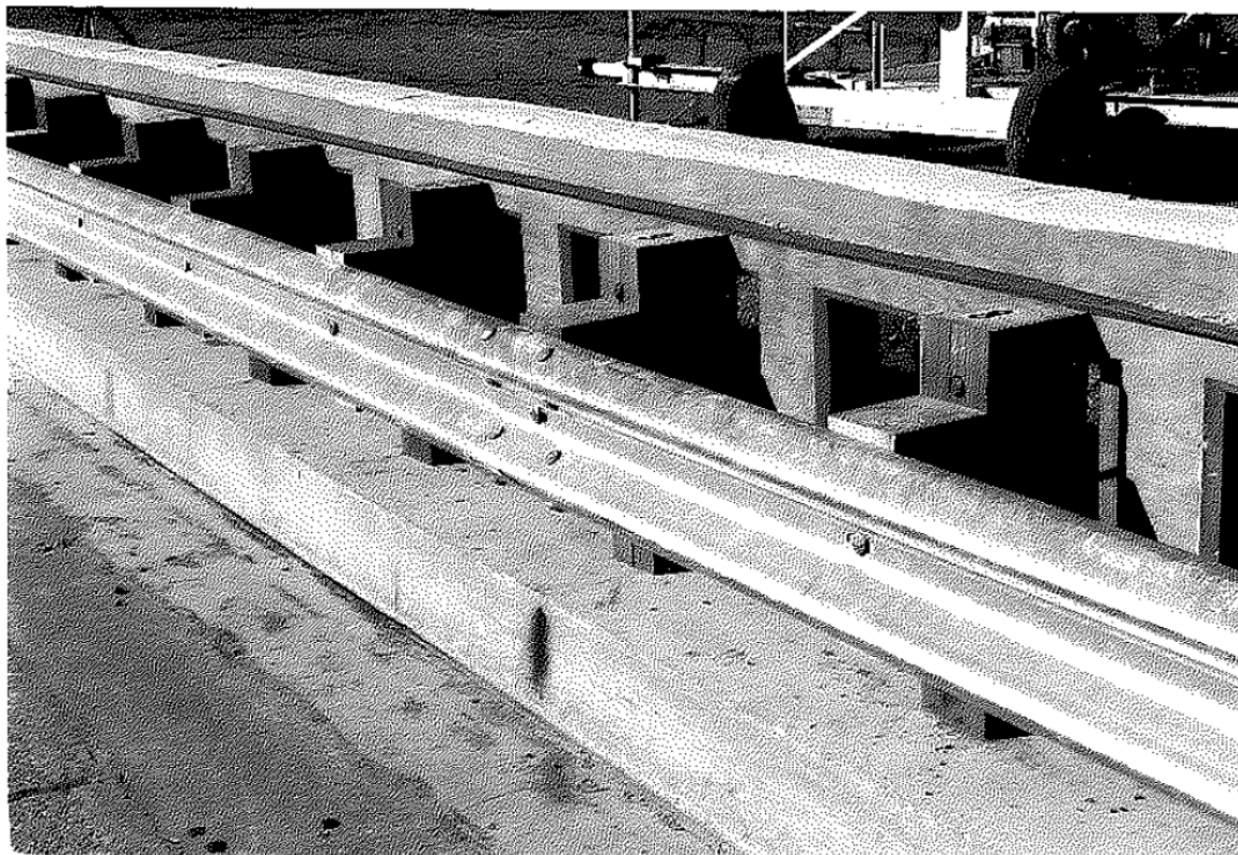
Photograph of Traffic Side View of Concrete Rail Retrofit Project No. 472070
